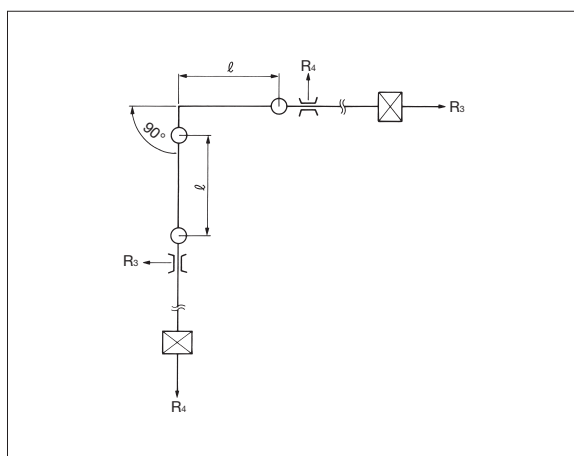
Connection of the UB type joints, anchoring points and guides (4)
